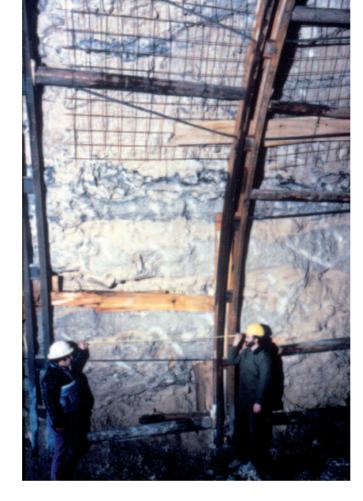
DETAIL OF THE GROUND AROUND THE CAVITY IMPROVED BY MEANS OF SUB-HORIZONTAL JET-GROUTING
